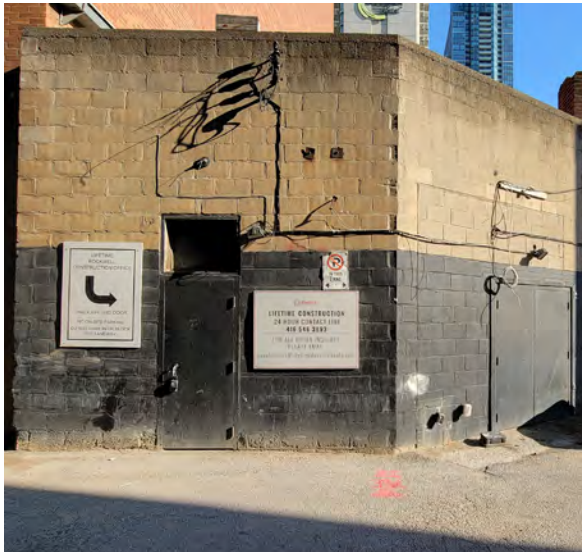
Rear masonry wall at grade is defective (ERA, 2022).
